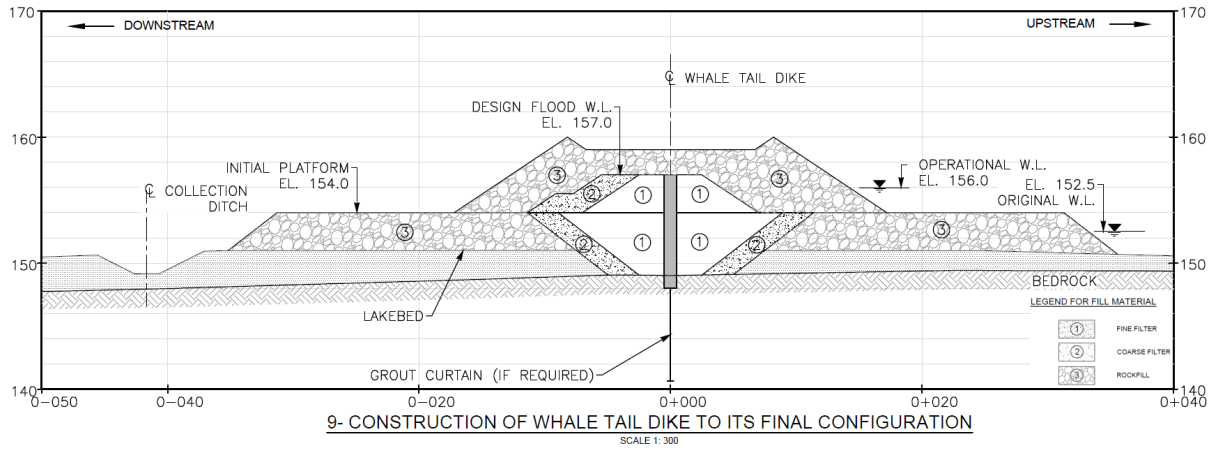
Typical Cross-Section of Whale Tail Dike
